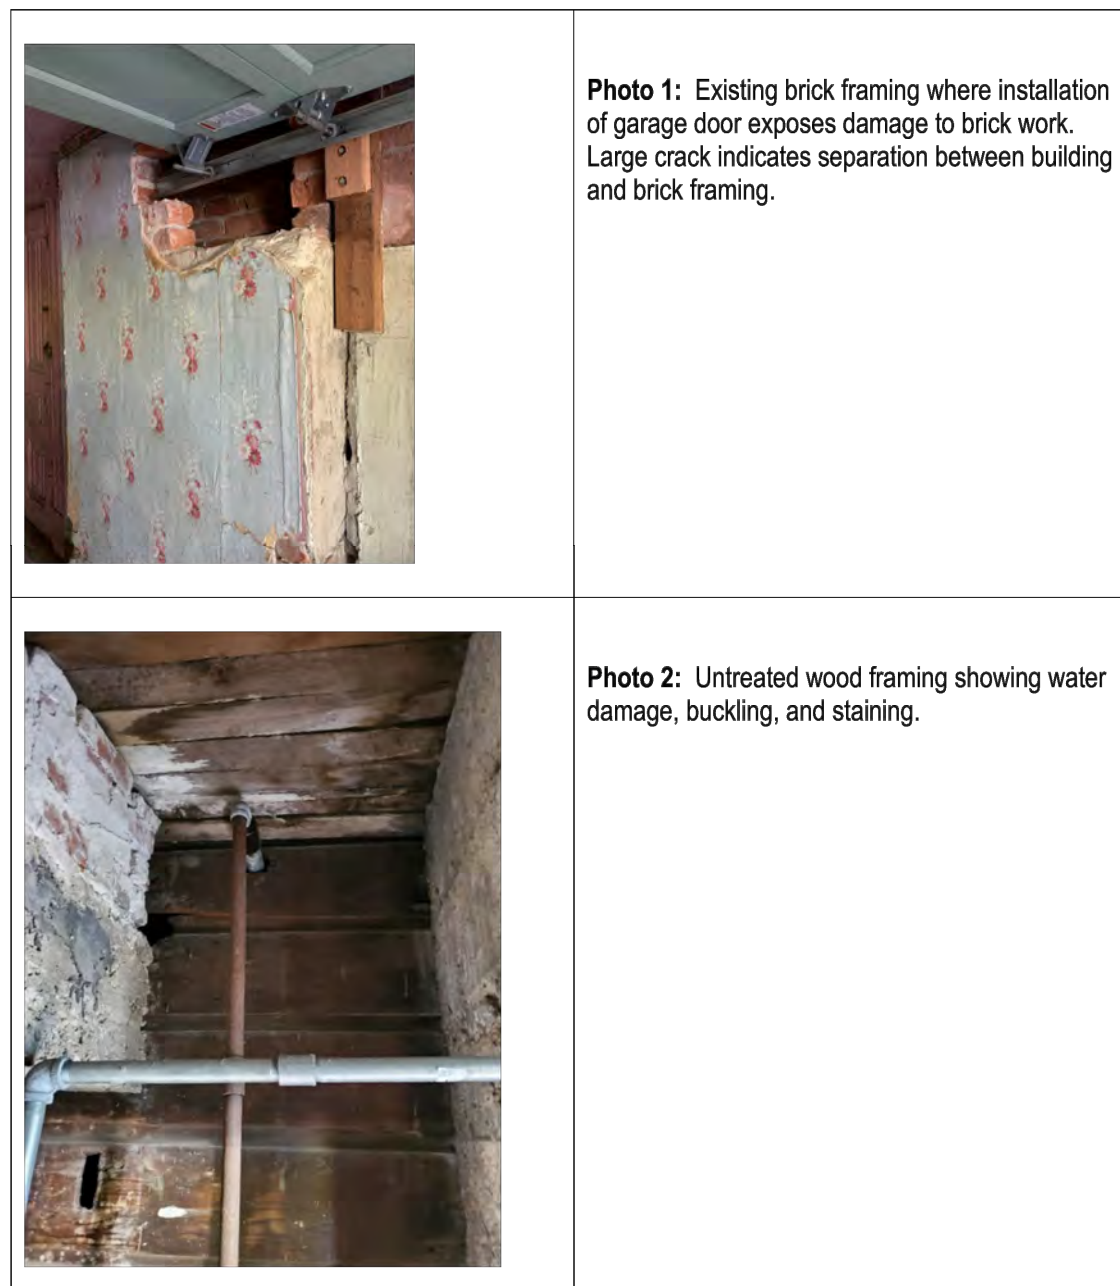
Existing brick framing where installation of garage door exposes damage to brick work. Large crack indicates separation between building and brick framing.
